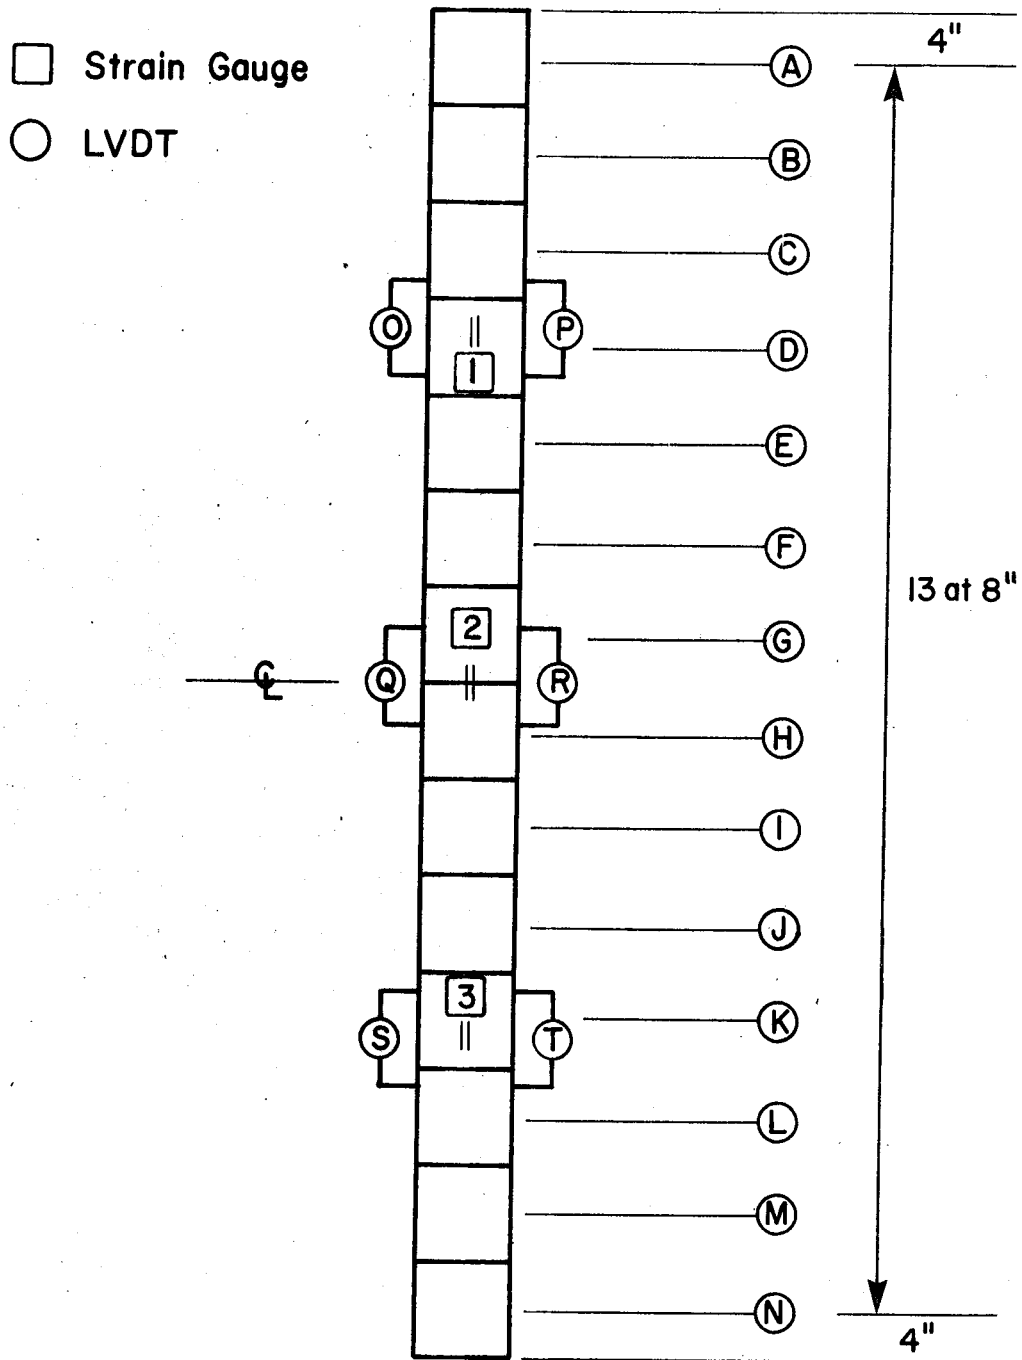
Location of Instrumentation for Walls Without Slabs (Series F)
